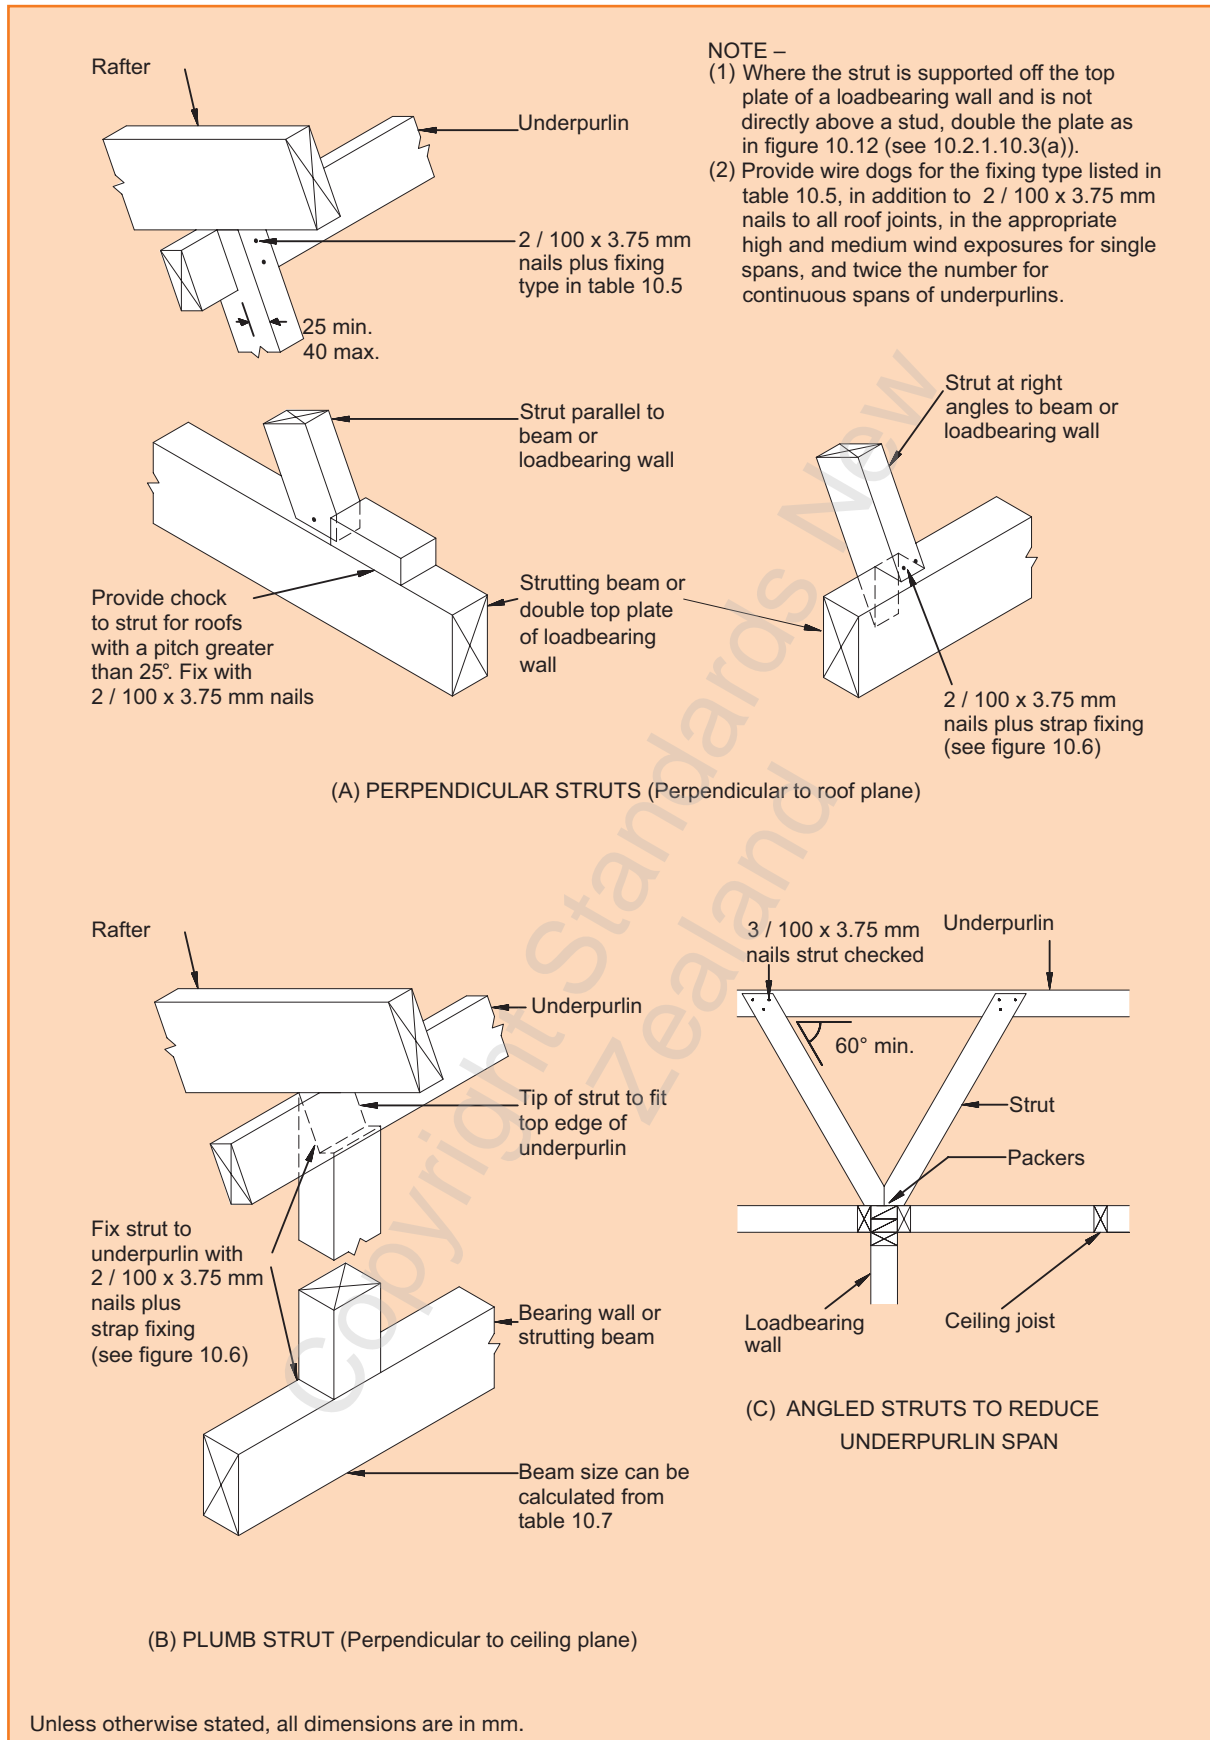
Underpurlin struts – Single (see 10.2.1.10.1(a))
